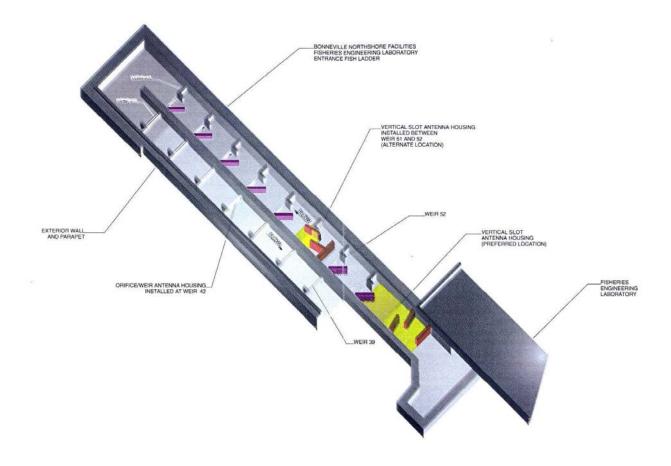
Antenna Housing Installation - Looking North from the Southwest
